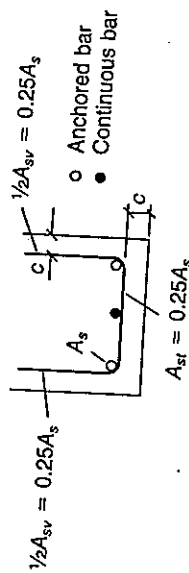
Additional reinforcement in an anchorage zone with bar diameter greater than 32 mm and no transverse compression: in this case, $n_1 = 1$, $n_2 = 2$, and $A_{st} = \frac{1}{2} A_{sv} = 0.25 A_s$
